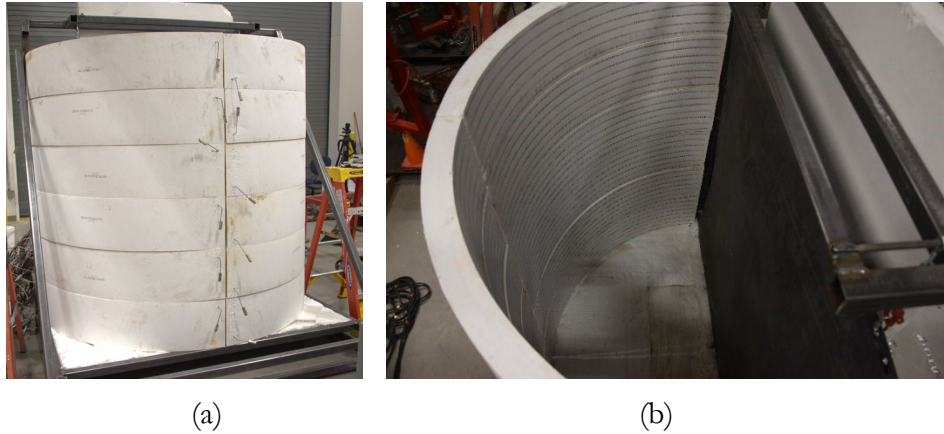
Concrete wall experiments: (a) ceramic heaters, and (b) top view showing the stainless-steel shroud on the right
